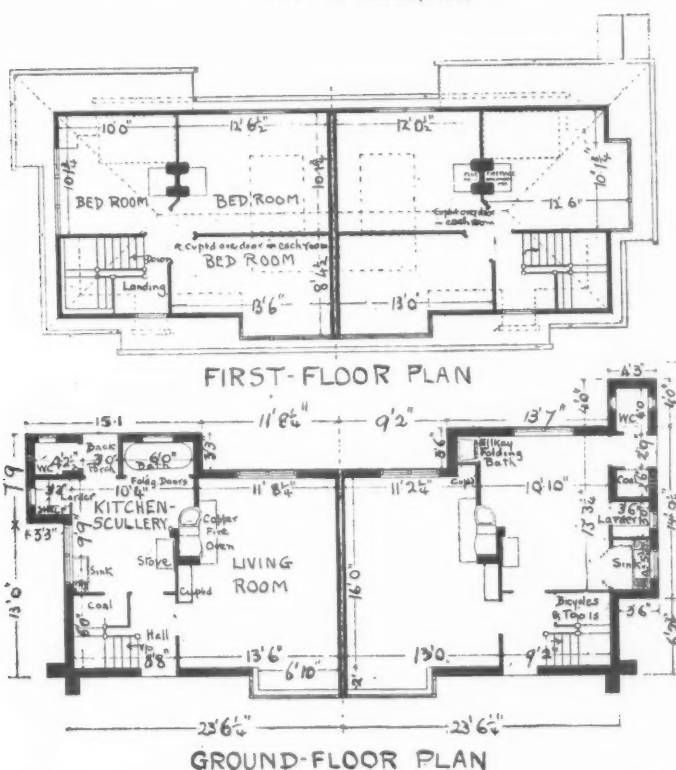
PAIR OF BRICK COTTAGES FOR THE LETCHWORTH BUILDING SYNDICATE. V. DUNKERLEY, ARCHITECT.
